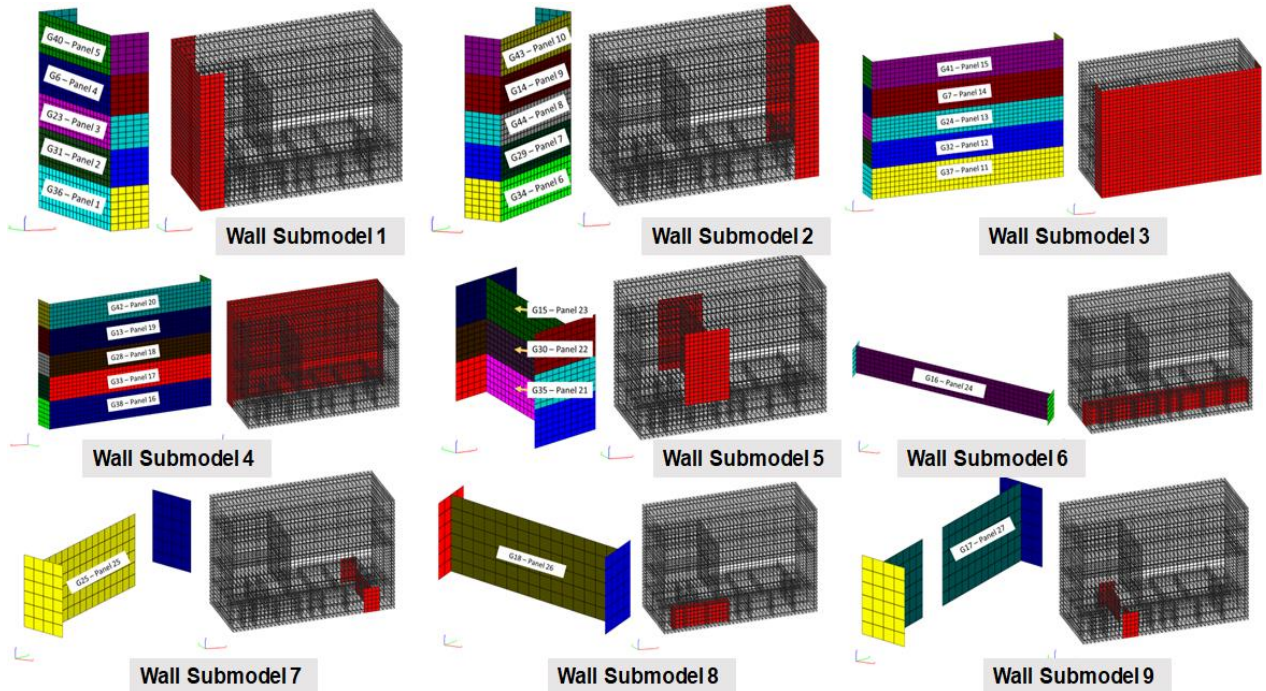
Nonlinear RC Wall Submodels for AB Structure
